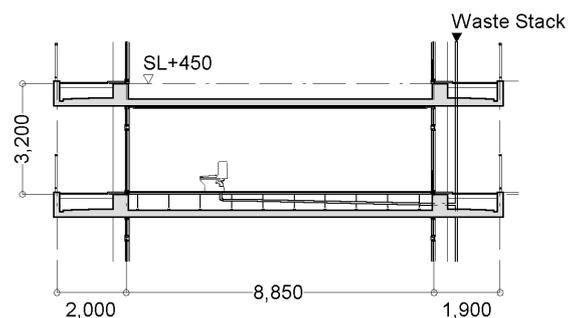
Cross-section of a Dwelling Unit with the Inverted Slab / Beam Structure
